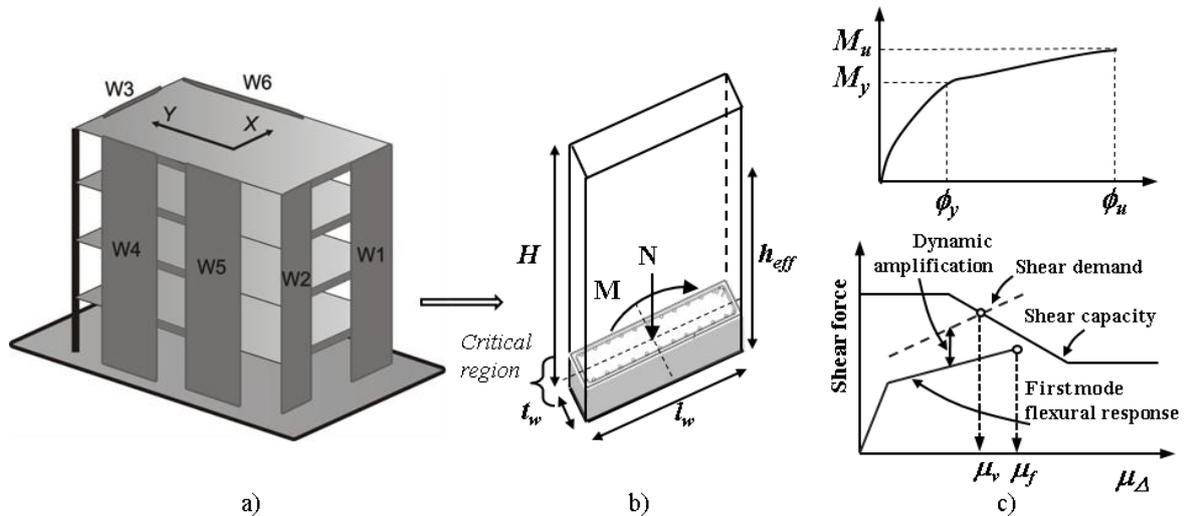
DBA procedure: a) Shear wall building; b) typical cantilever wall; c) flexural and shear capacities of critical section
